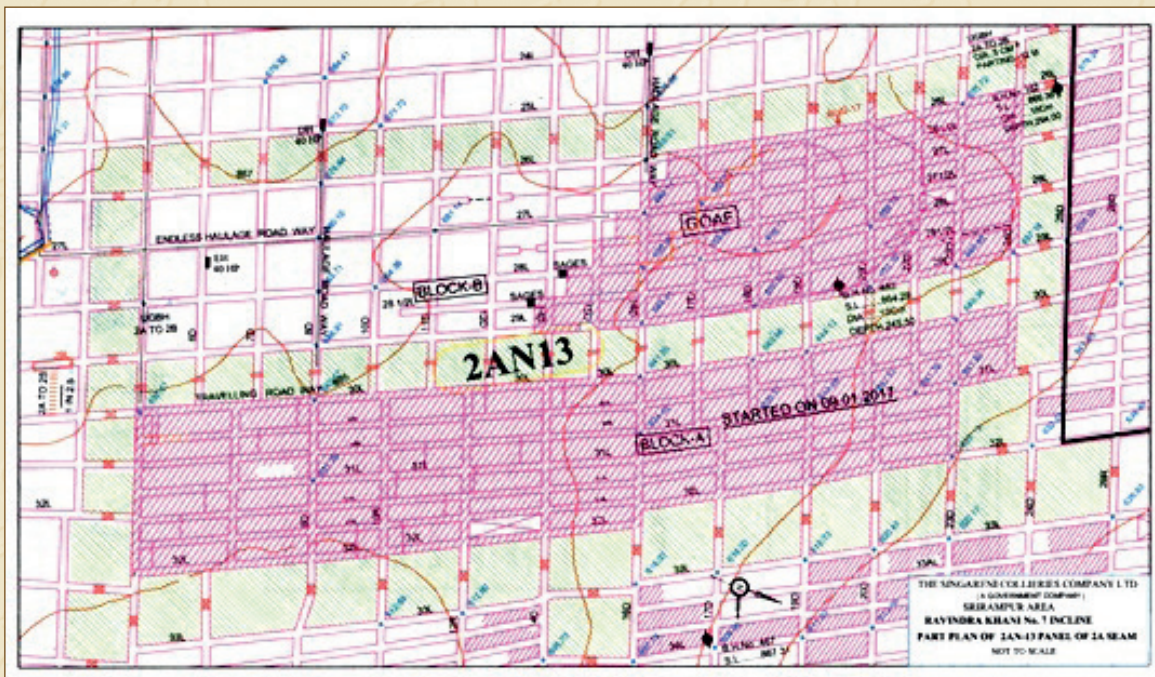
Plan of Block A and Block B of panel 2AN13, RK7 underground mine
